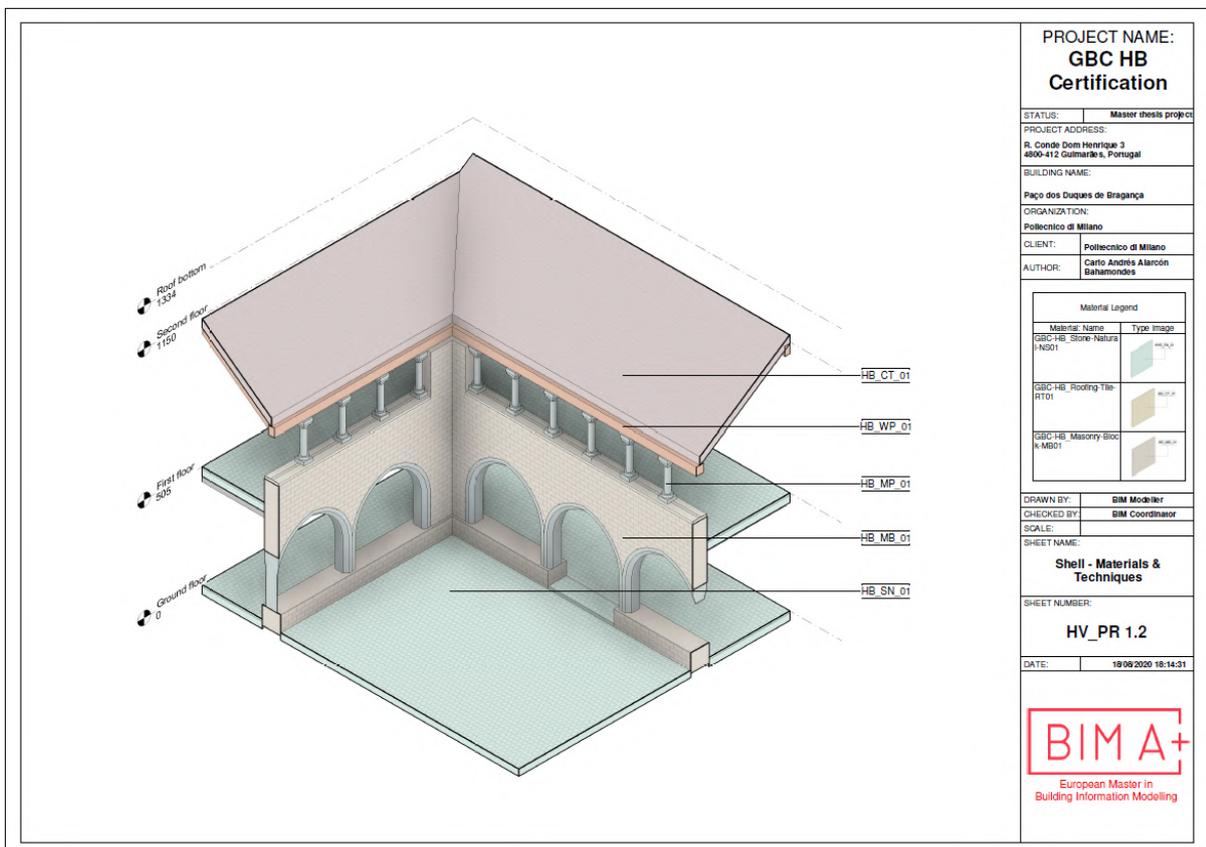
View sheet showing historic materials of the building shell. Source: author.
